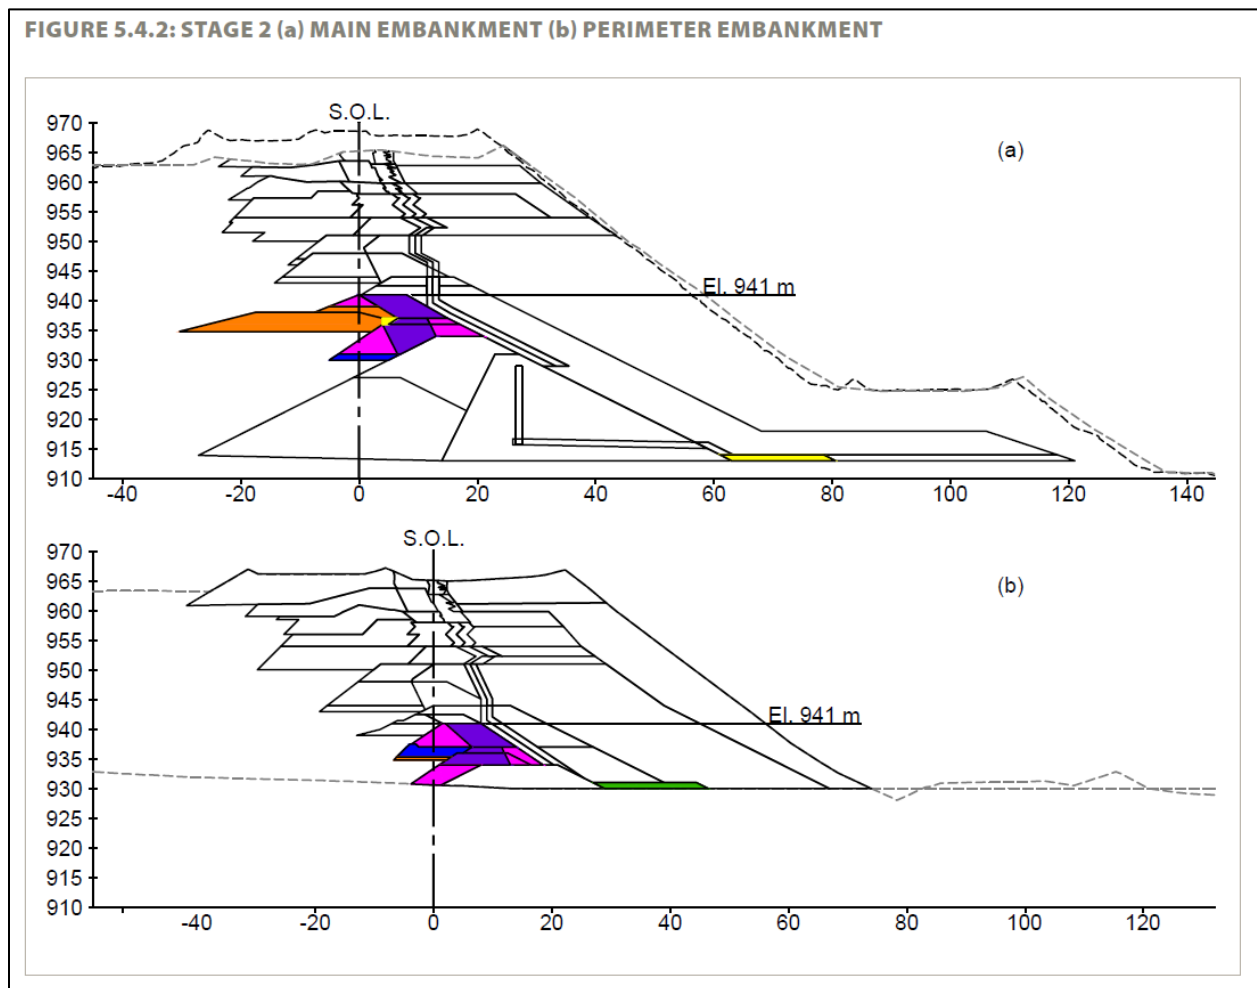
The above diagram from ICOLD (2021) confirms that what has been called the “modified centerline” method (see Fig. 13) should be referred to as the “modified upstream” method. The so-called “modified centerline” method retains the essential characteristics of the upstream method in that successive dikes are constructed on top of uncompacted tailings (compare with Fig. 12a). Figure from ICOLD (2021).
